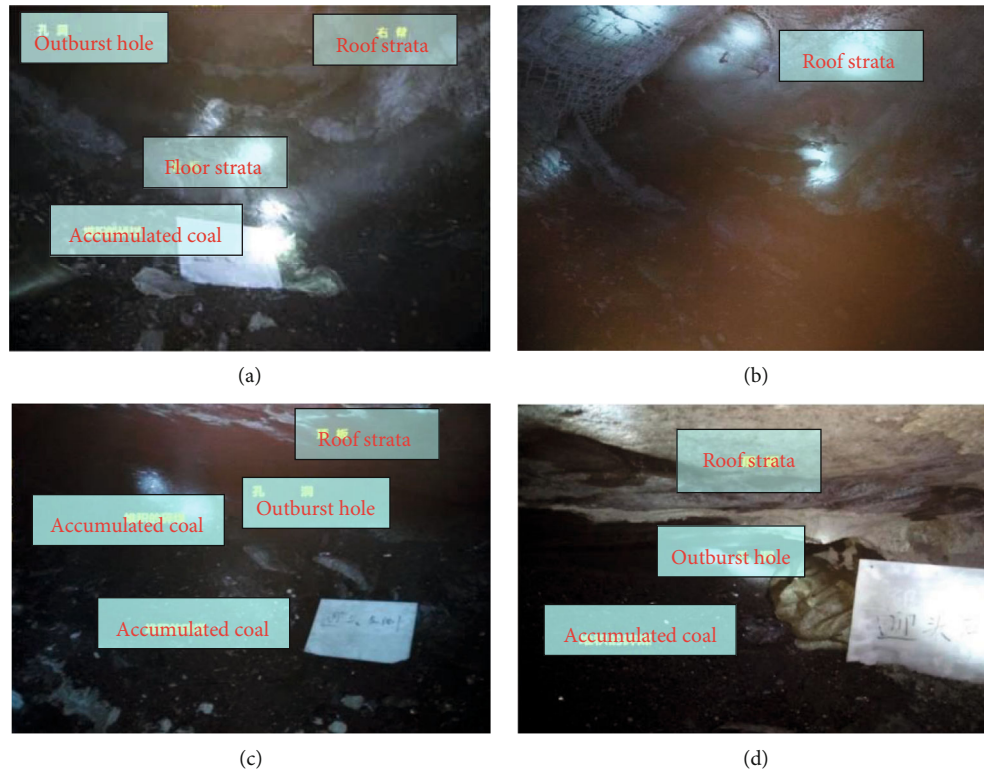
Photographs of coal and gas outburst in Didao Coal Mine (Heilongjiang Province, China): (a) working face; (b) roof of working face; (c) hole in left side of working face; (d) hole in right side of working face.
